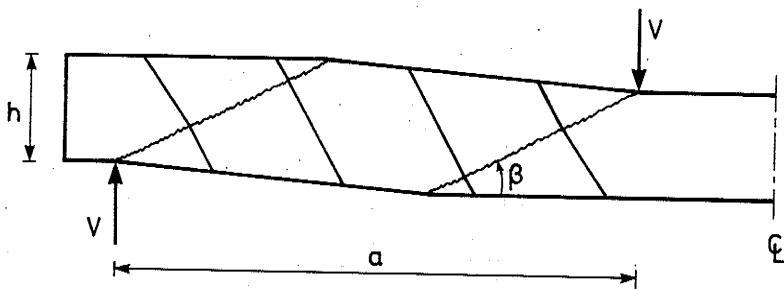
Shear failure mechanism for reinforced concrete beam.
